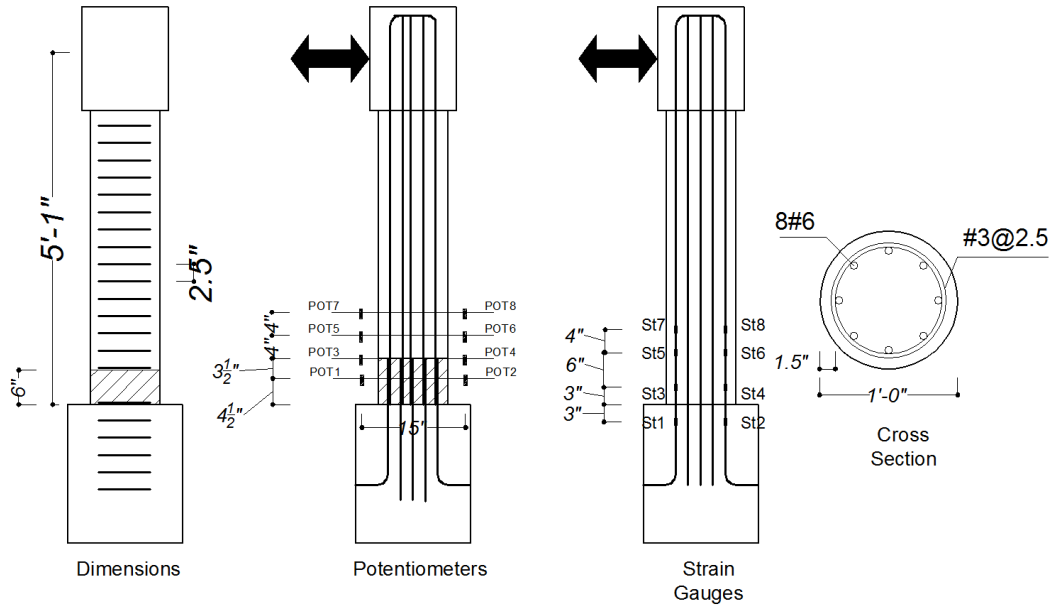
Specimen S-6-8, dimensions, reinforcement and measurement tools details (No stirrups at splice region).
